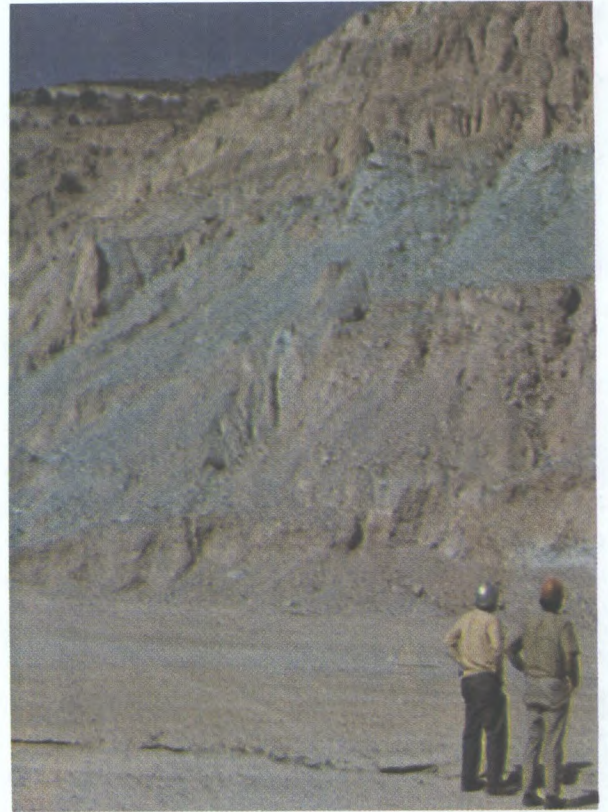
Cracking 100 ft (30 m) beyond the toe of a 300 ft (91 m) high wall.
